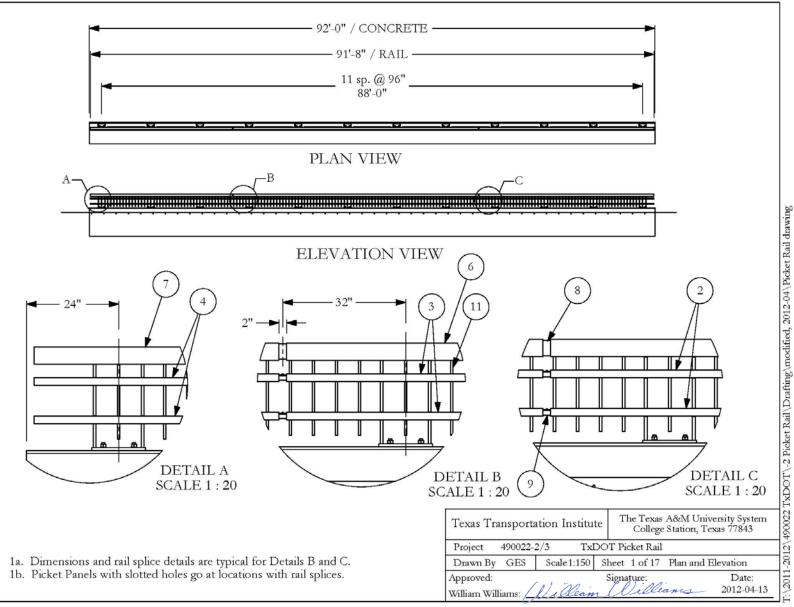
Details of the TxDOT Picket Rail Installation.
